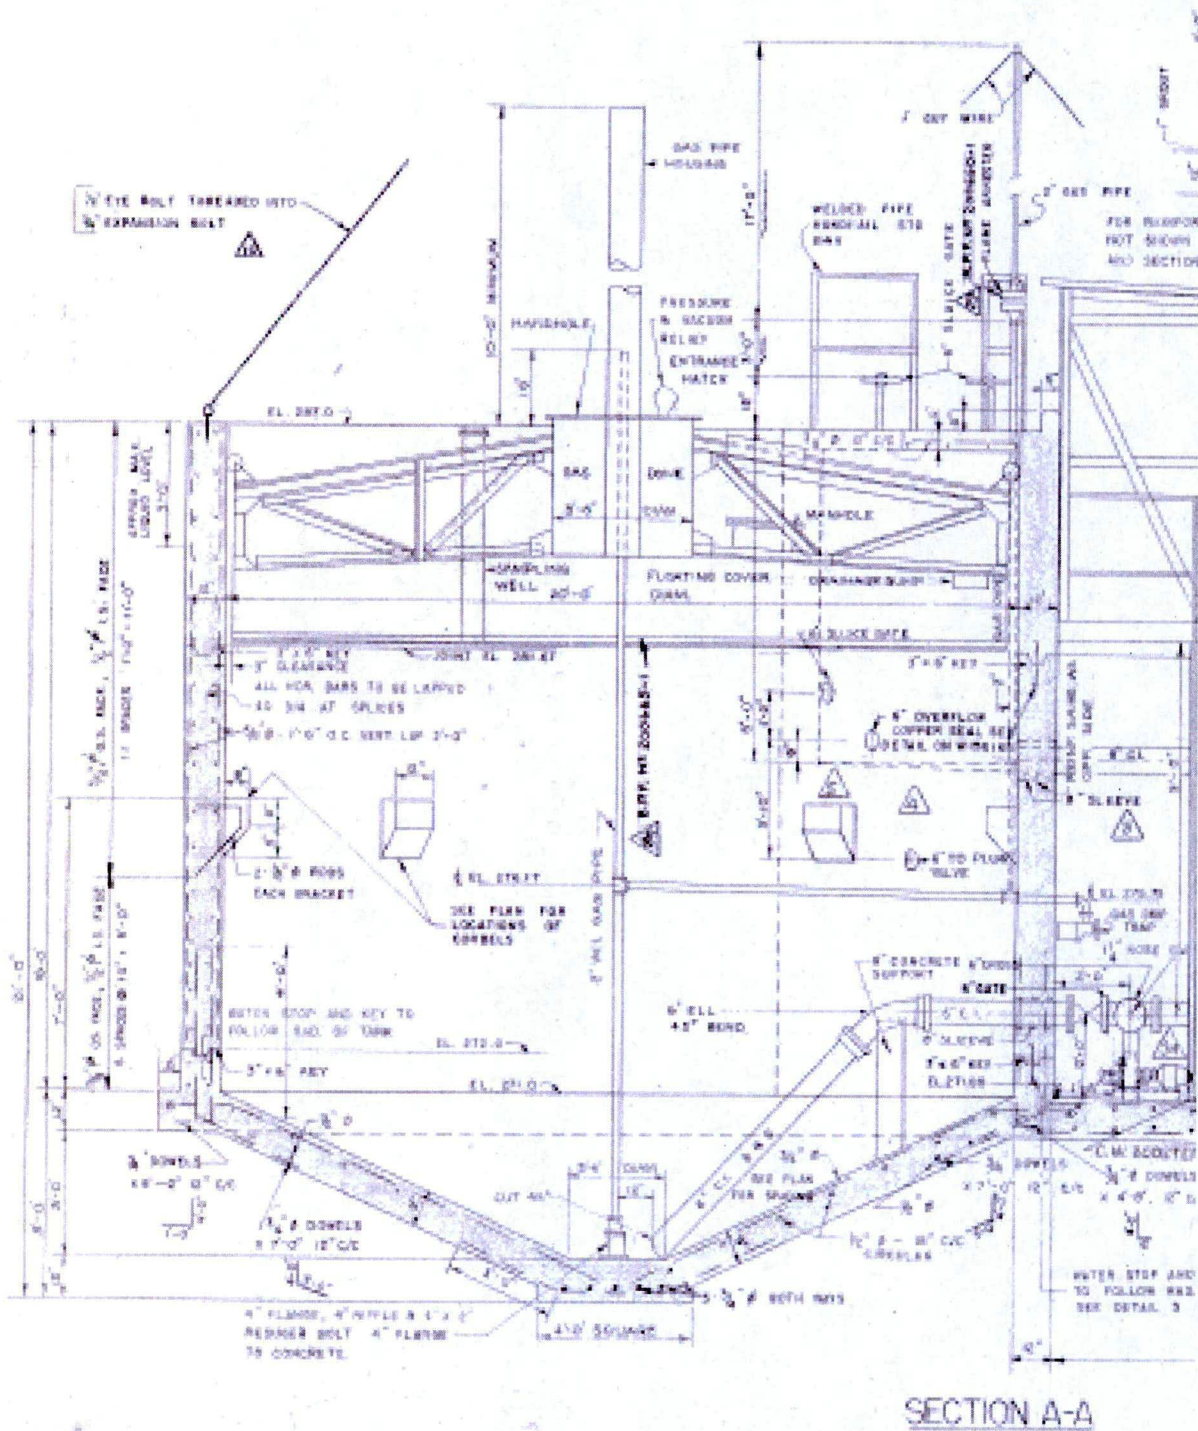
Section View of Sludge Digestion Tank (from Dwg. W156164)
